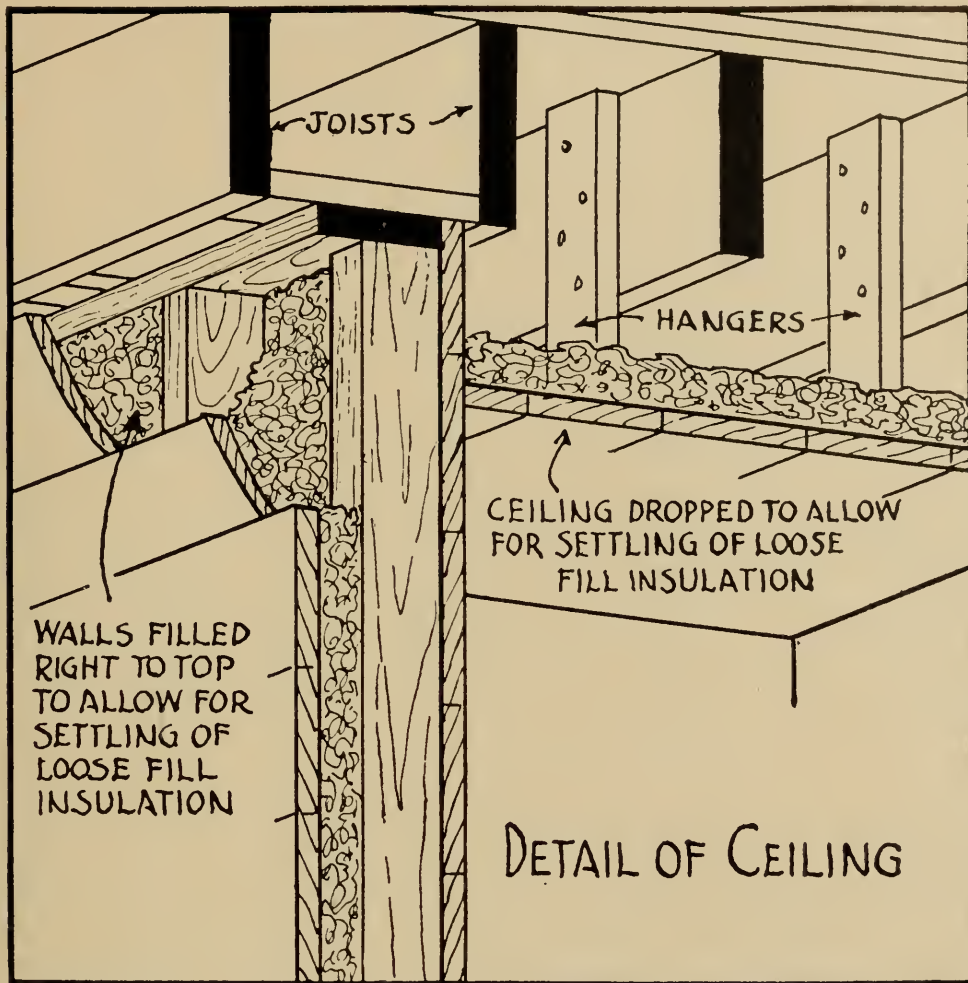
Application of loose fill insulation to ceiling area. Note hangers to prevent joist contact and provide more space.
